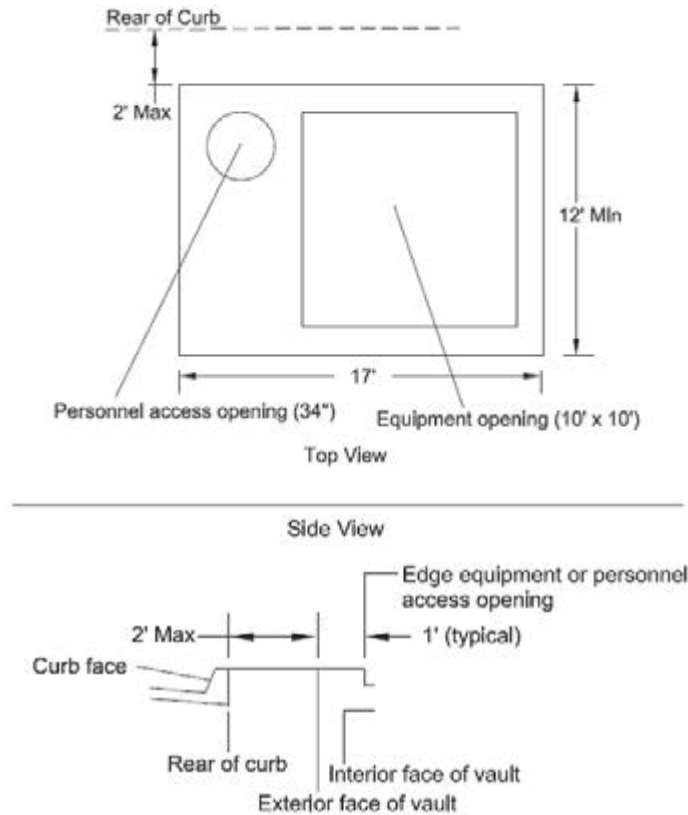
Proximity of Below Grade Vault equipment and personnel access opening to street.
